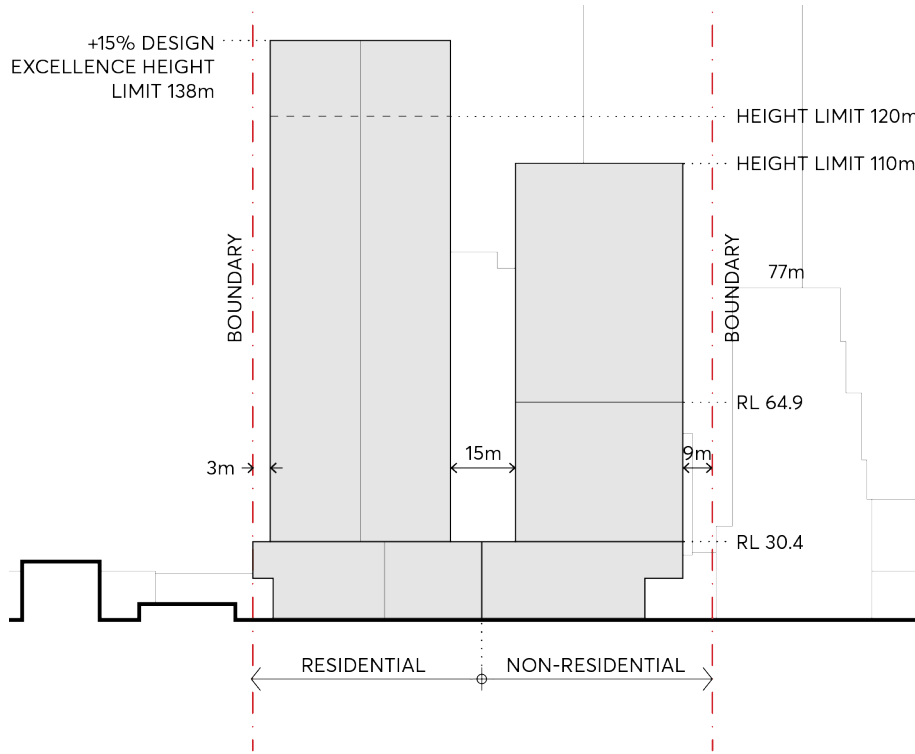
Building envelope Jubilee Park elevation
